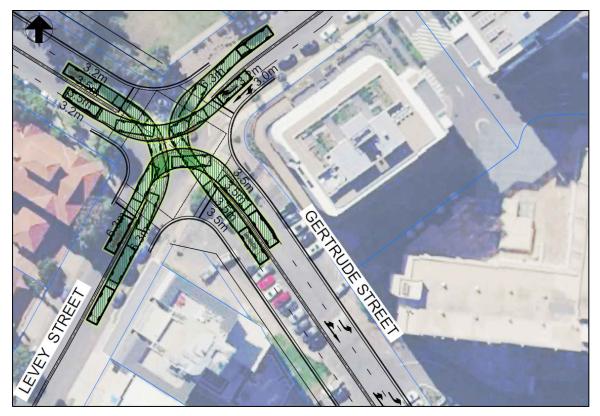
Intersection design – Gertrude Street / Levey Street Source: Arup
